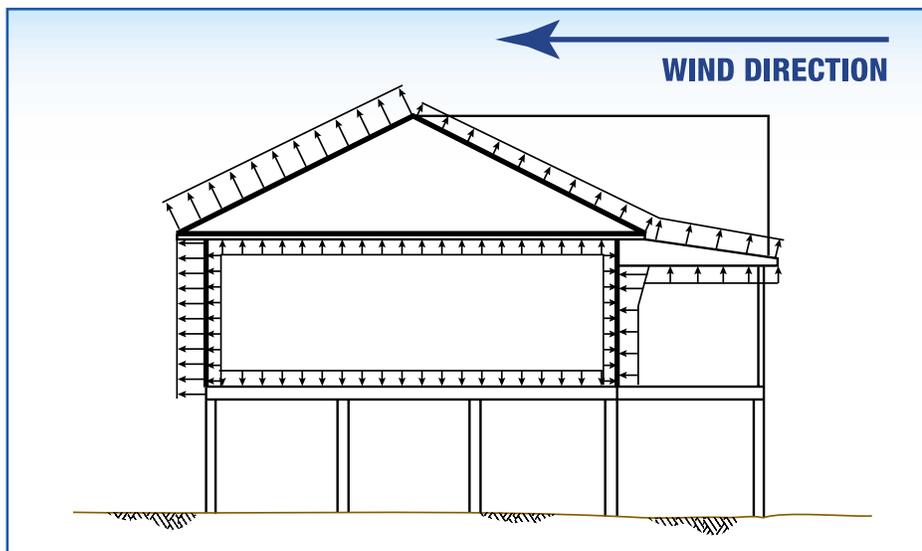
shows the distribution of these pressures on the building that appears in the Wind Load Example Problem on pages 11-45 through 11-47.
